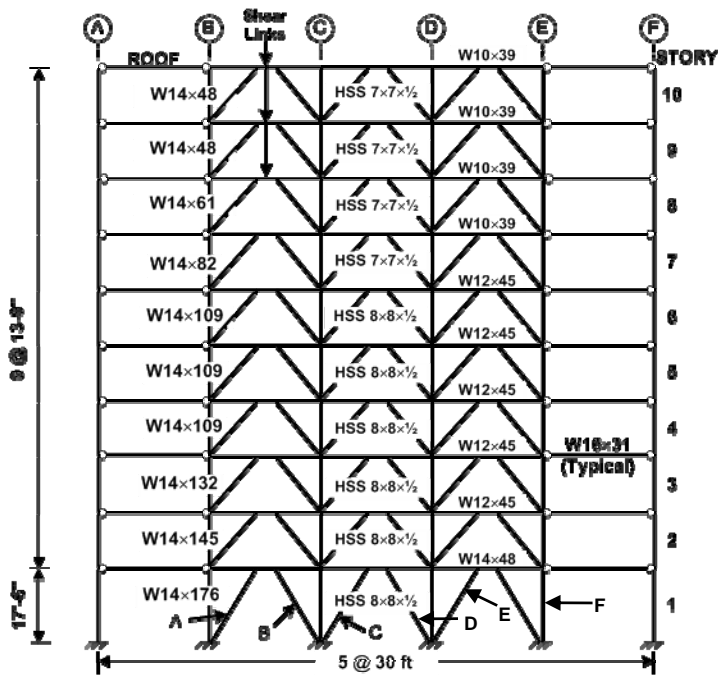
EBF Building Frame (SDC-D): E-W Elevation (Line 6)
